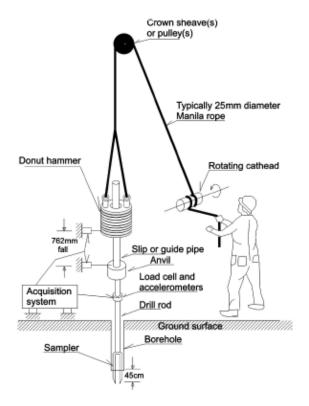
Equipment of Standard Penetration Test (Source: Schnaid, 2009)
